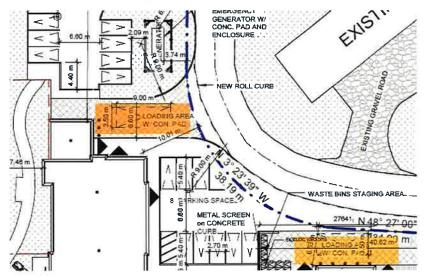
Excerpt from Site Plan showing proposed Loading Space accessed from municipally-owned driveway; Arcadis IBI Group, 2023.
